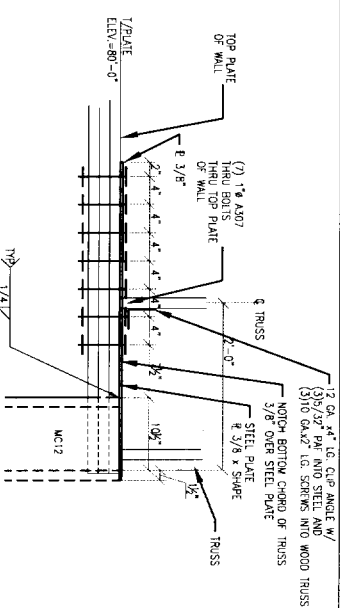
DETAIL @ TRUSS TO EXT. WALL CONNECTION S2.2
